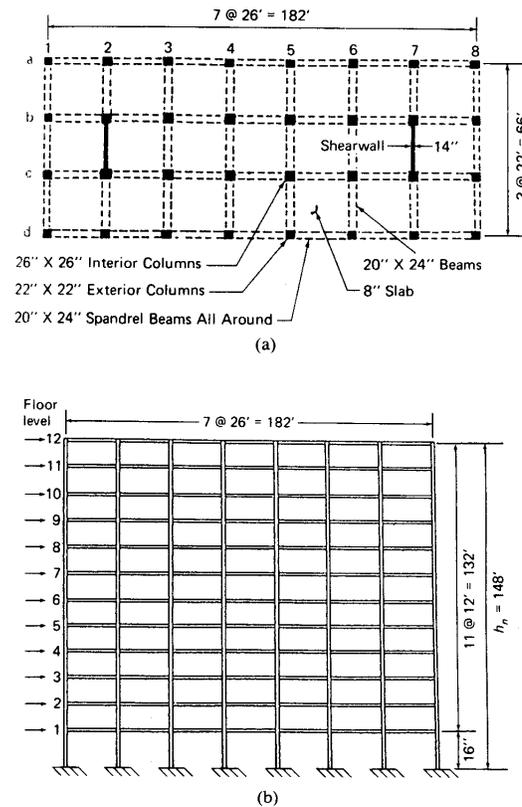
Structure considered in design example. (a) Typical floor framing plan. (b) Longitudinal section
